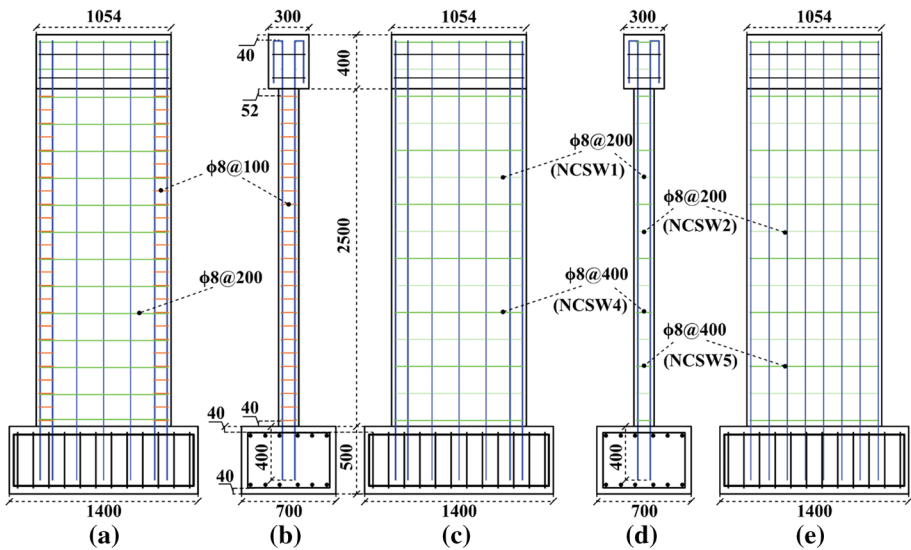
Reinforcement details of the test specimens. Reference (CSW0) a front and b side sections, c NCSW1 and NCSW4 front sections d NCSW side section e NCSW2 and NCSW5 front section. Dimensions in (mm)
